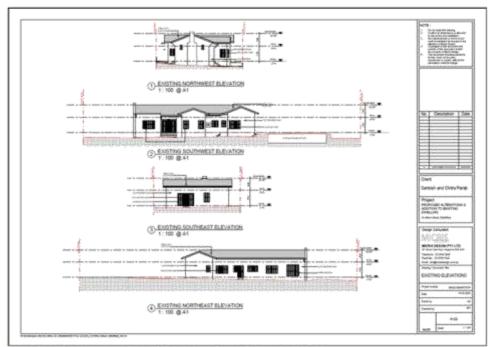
Existing elevations (received by Heritage 21 on 11 September 2020).
